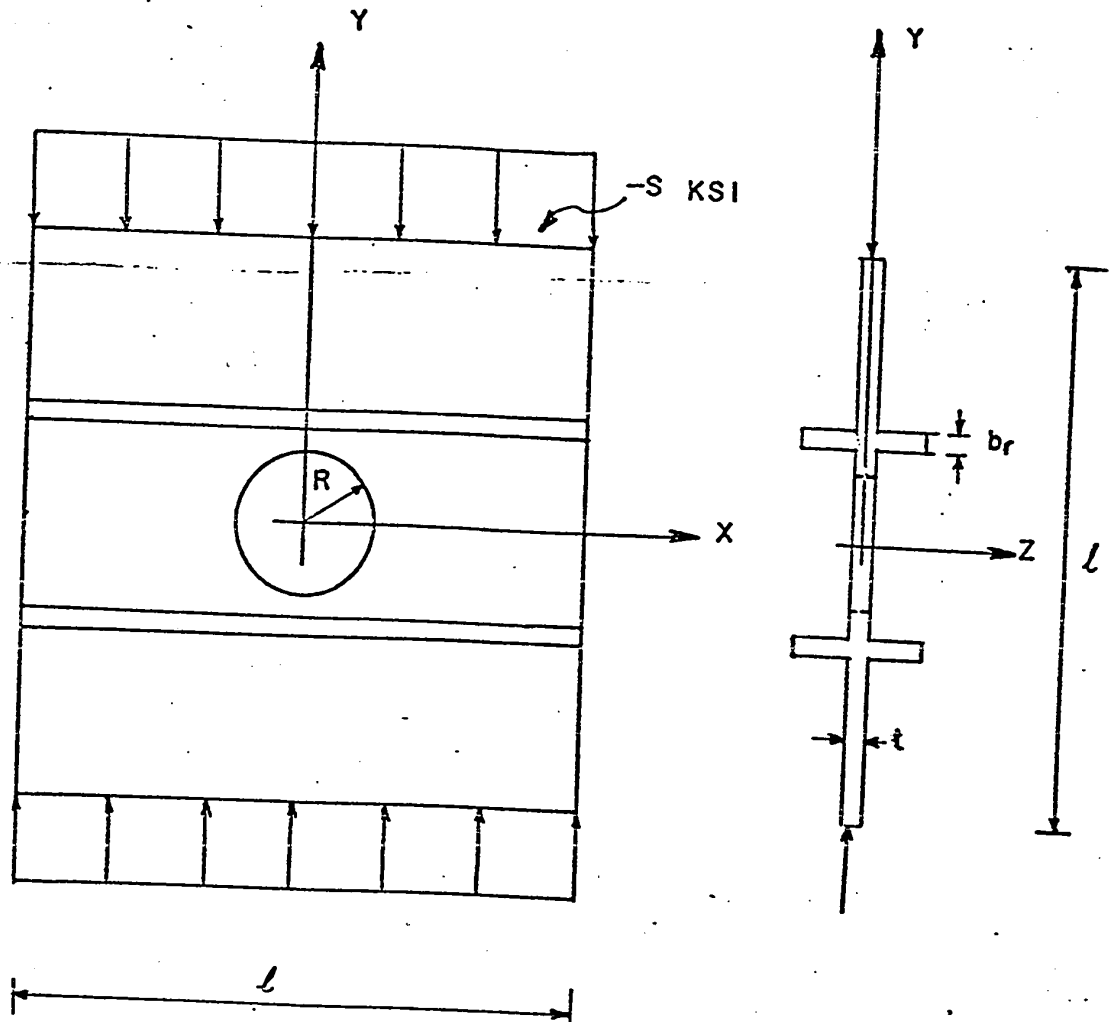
DIMENSIONS & DETAILS OF TRANSVERSELY STIFFENED
